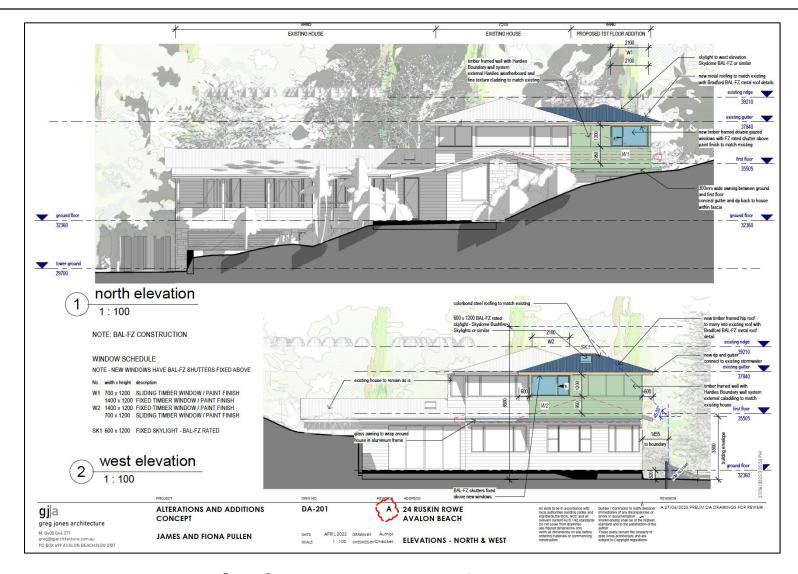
ILLUSTRATES PROPOSED NORTH & WEST ELEVATIONS
